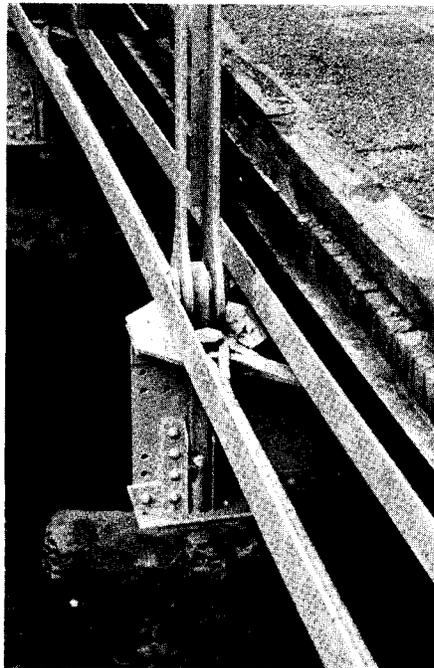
Lower joint connection detail of metal truss in Figure 14.
